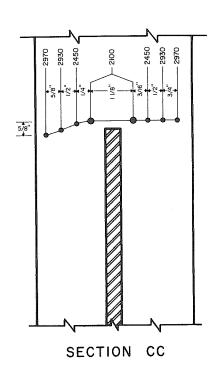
JOINT TYPE 3 - SPECIMEN No. 4 (TAPERED GUSSET PLATE)
